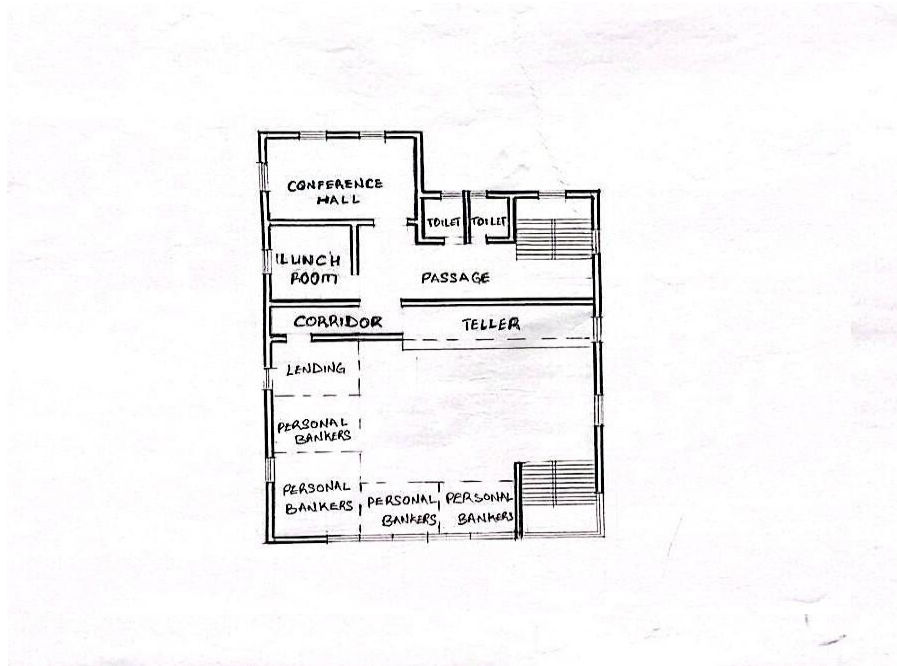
GROUND FLOOR PLAN (CASE STUDY ONE)
